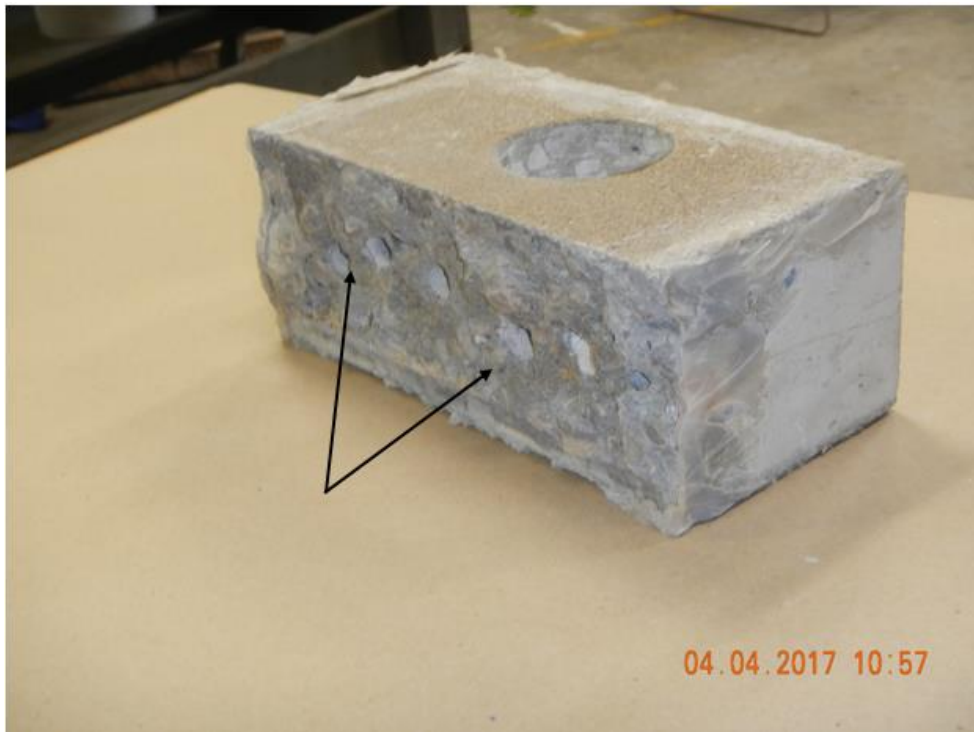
Fractured Surface (Arrows Indicate Sample Collection Area)
